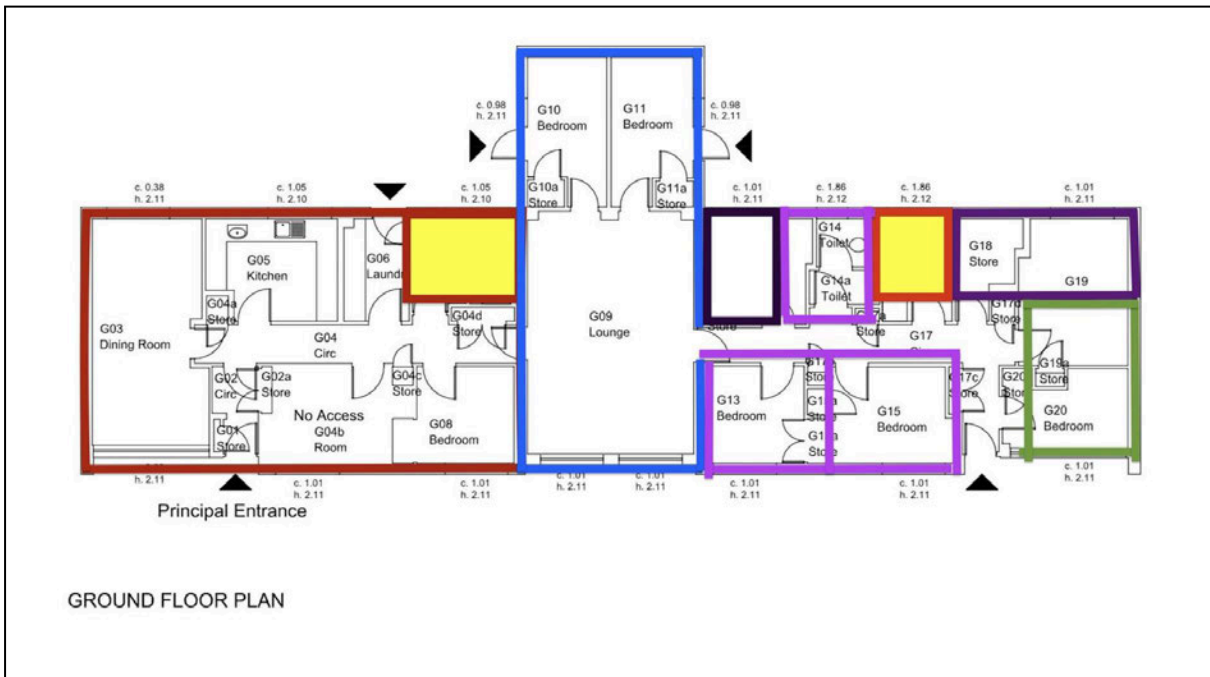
Proposed New Floor Plan of Longcroft Cottages
